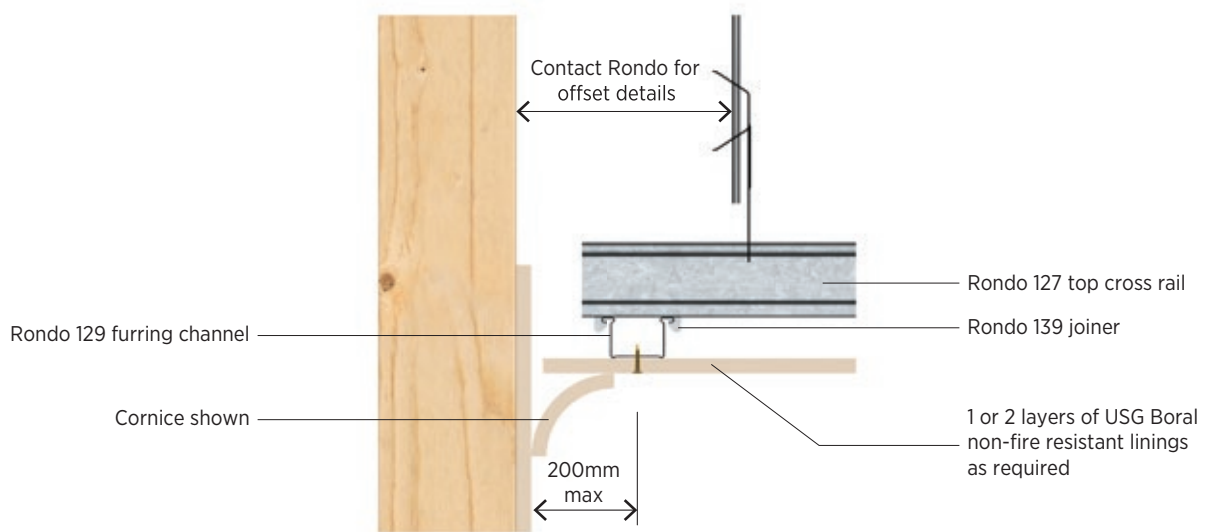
Typical Perimeter Detail - Section Through Furring Channel
